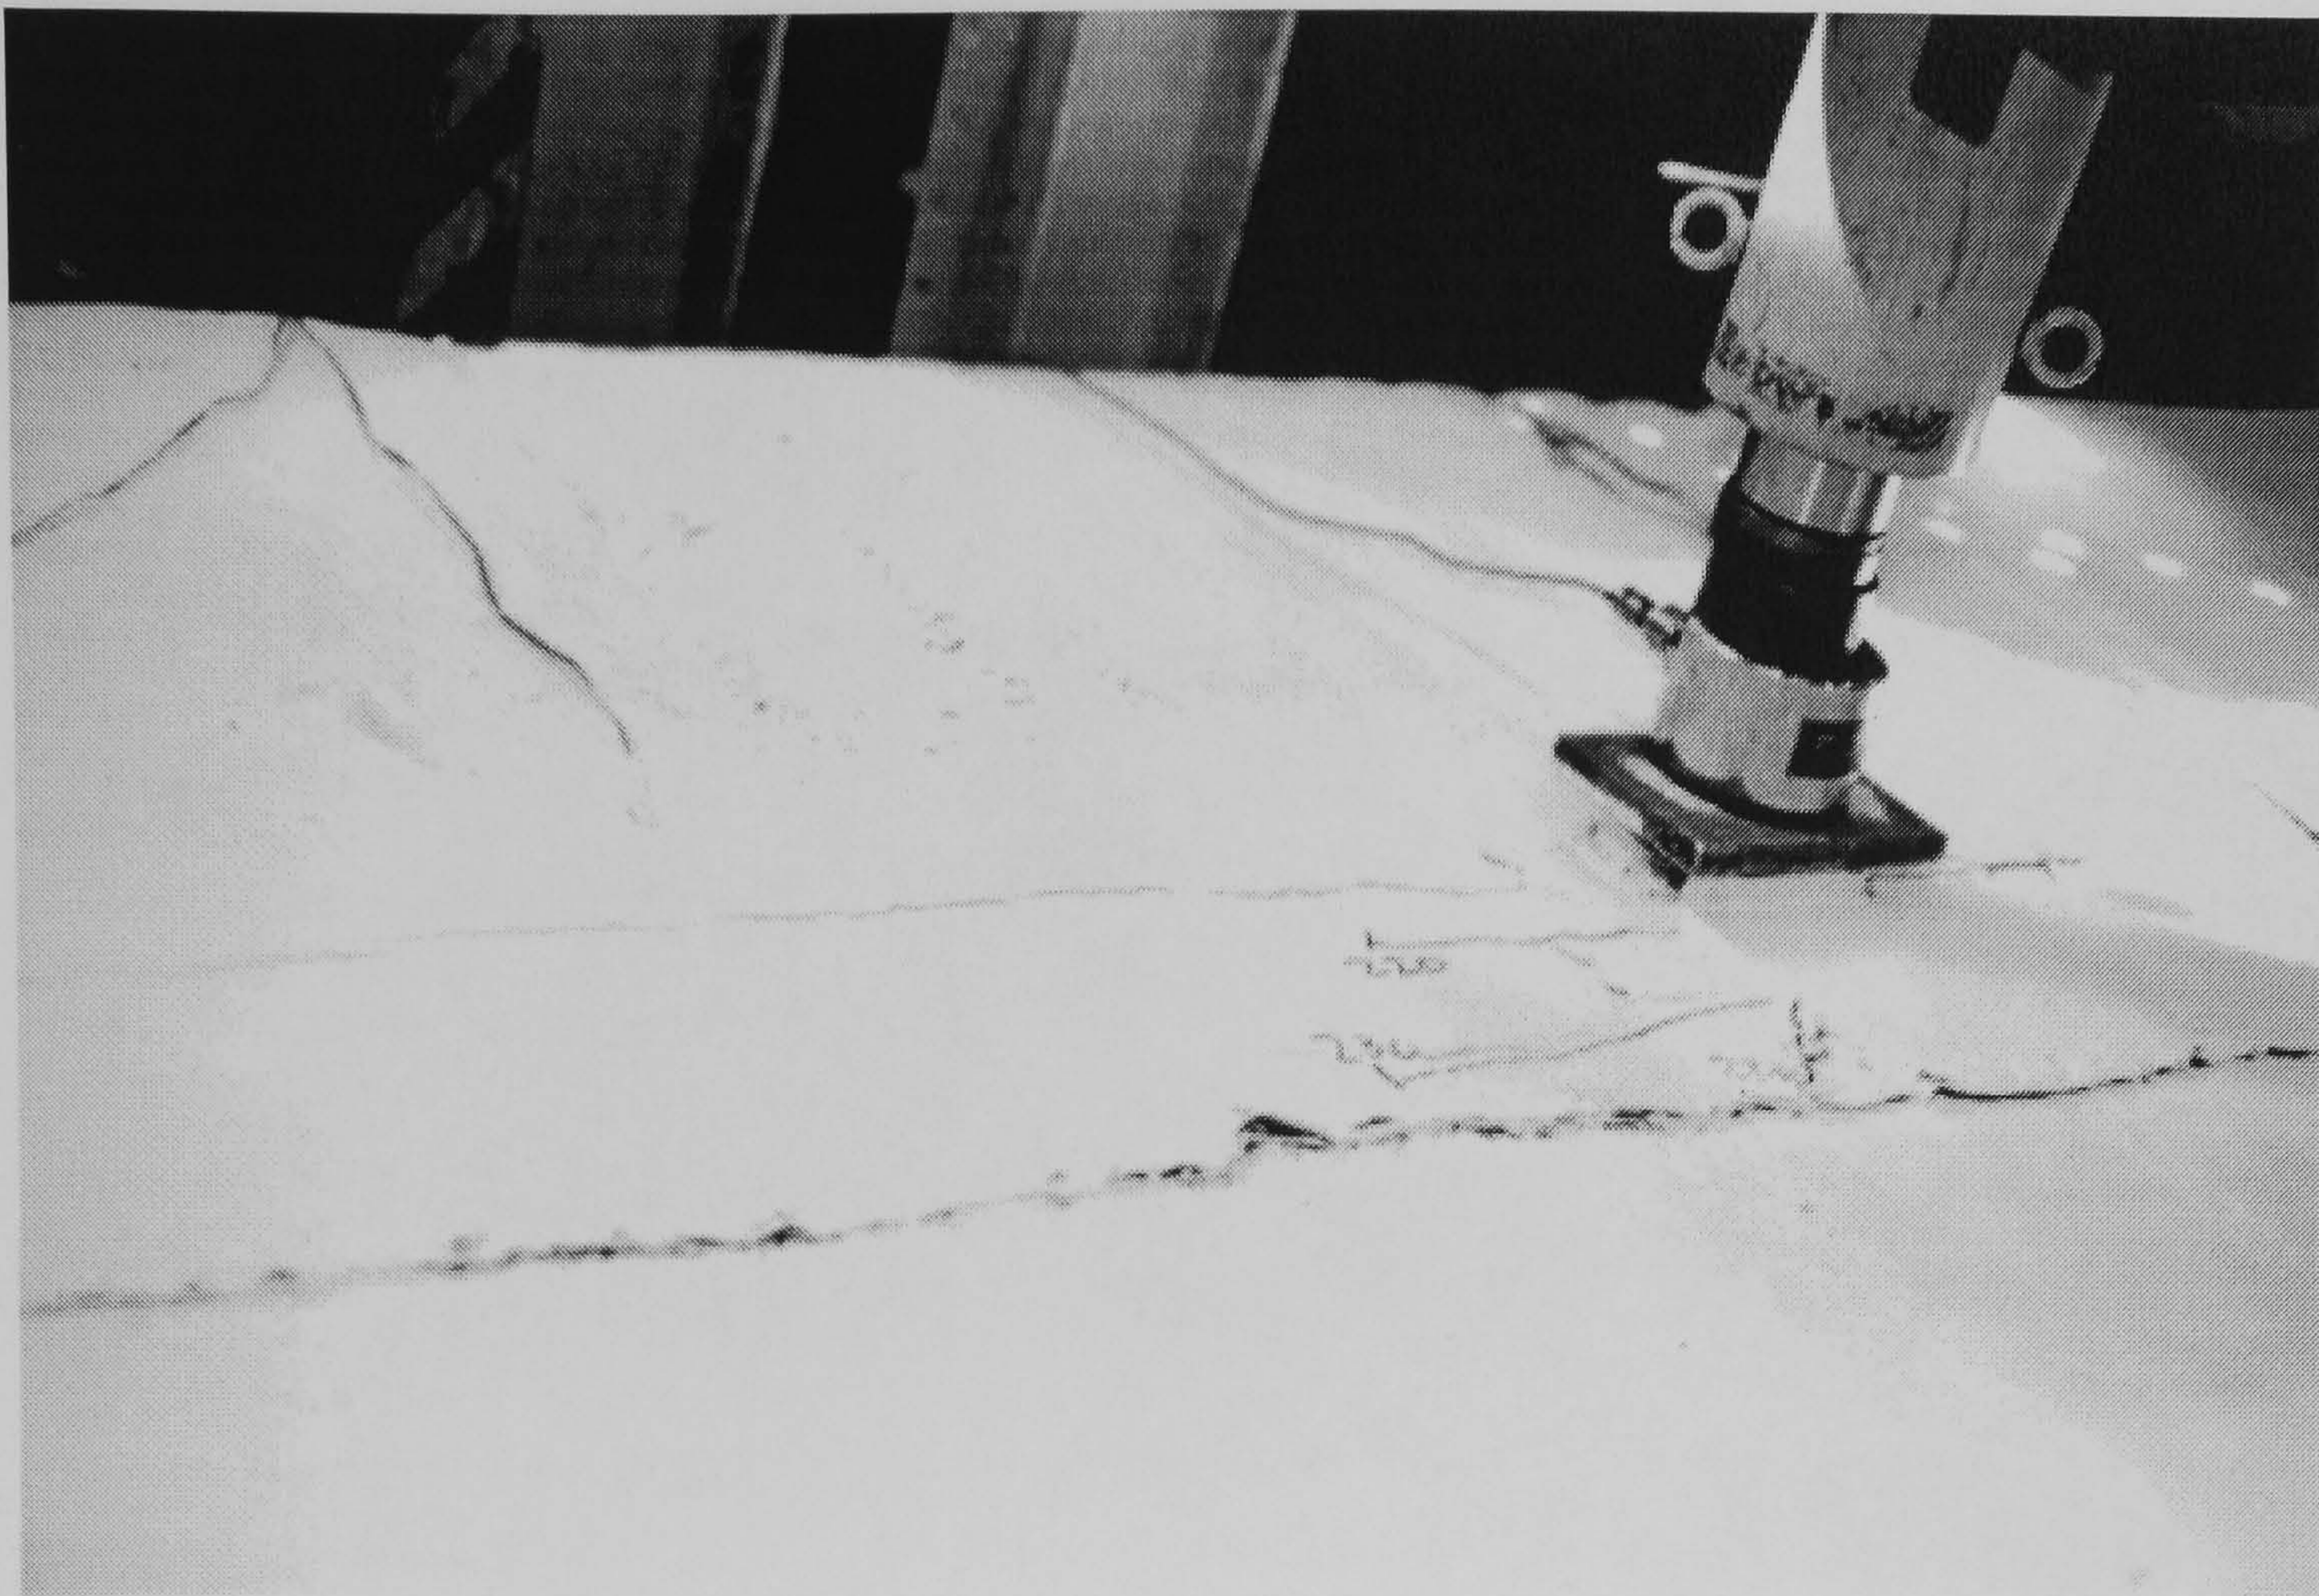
Cracks at slab surface of Test CB3
